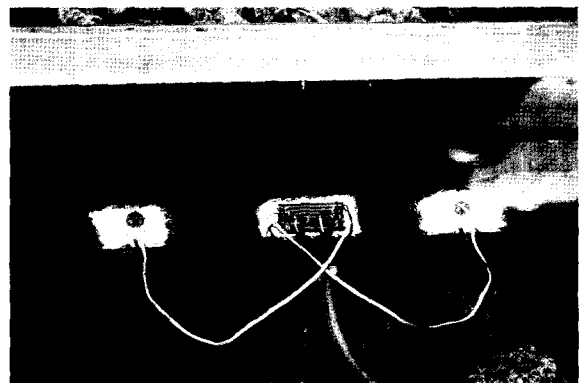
Example of Lateral wheel pressure gauge in rail flange
